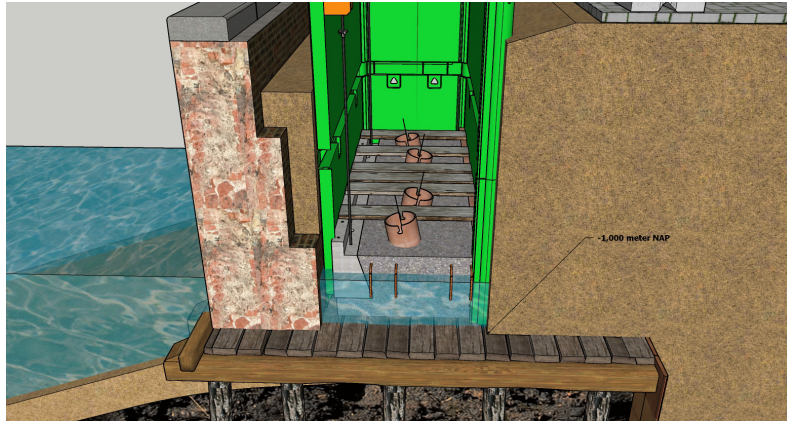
The underwater concrete is deposited next to the prefab concrete element. [36]
